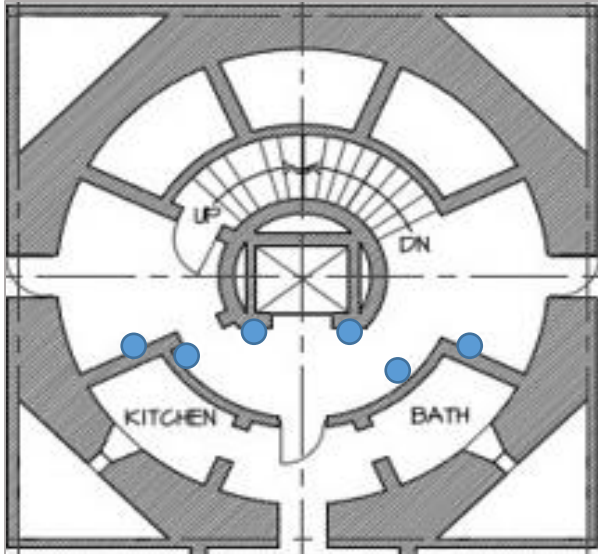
Location of observed efflorescence and other damages on the second-floor murals.
